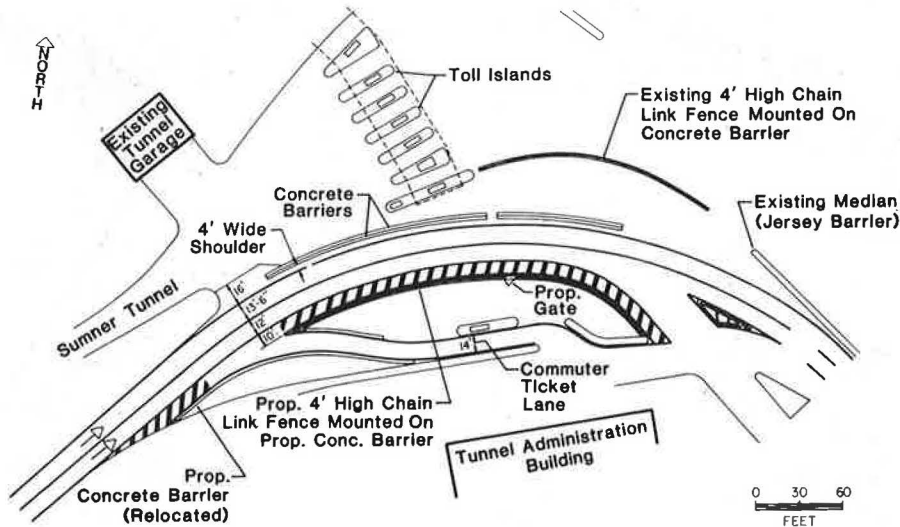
Alignment plan for Callahan and Sumner tunnels—approach roads.
